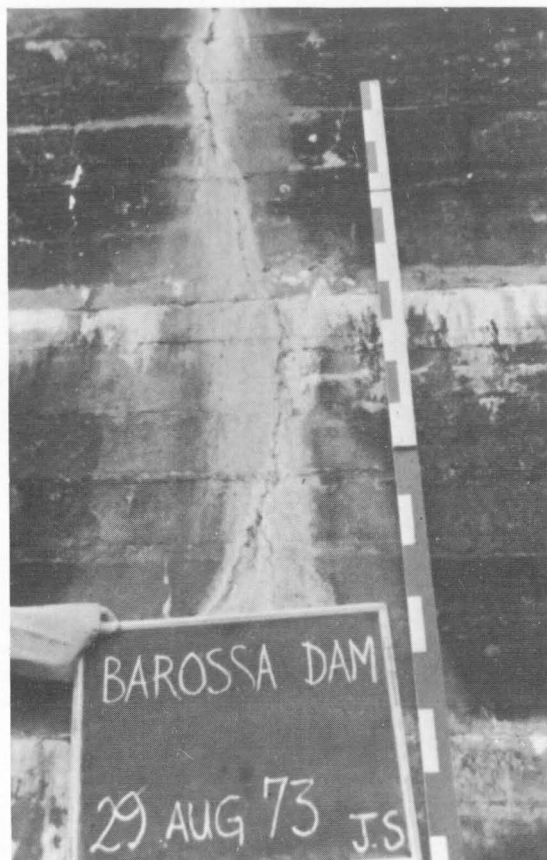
Vertical crack in wall of arch dam probably caused by 1954 earthquake.
